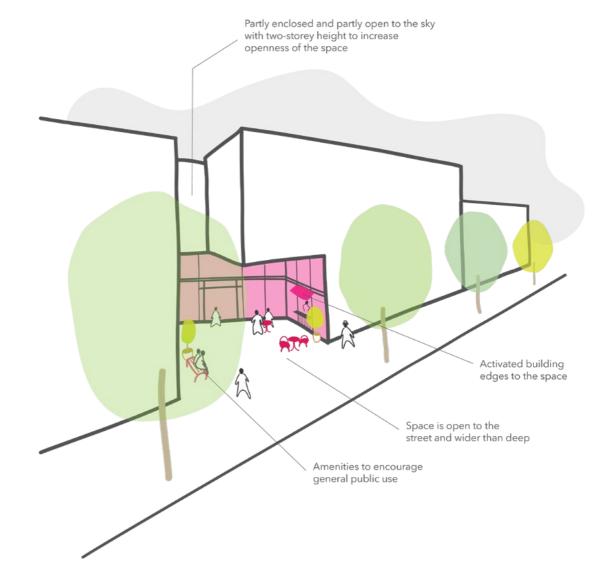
A publicly accessible, activated plaza-like space open to the street edge
